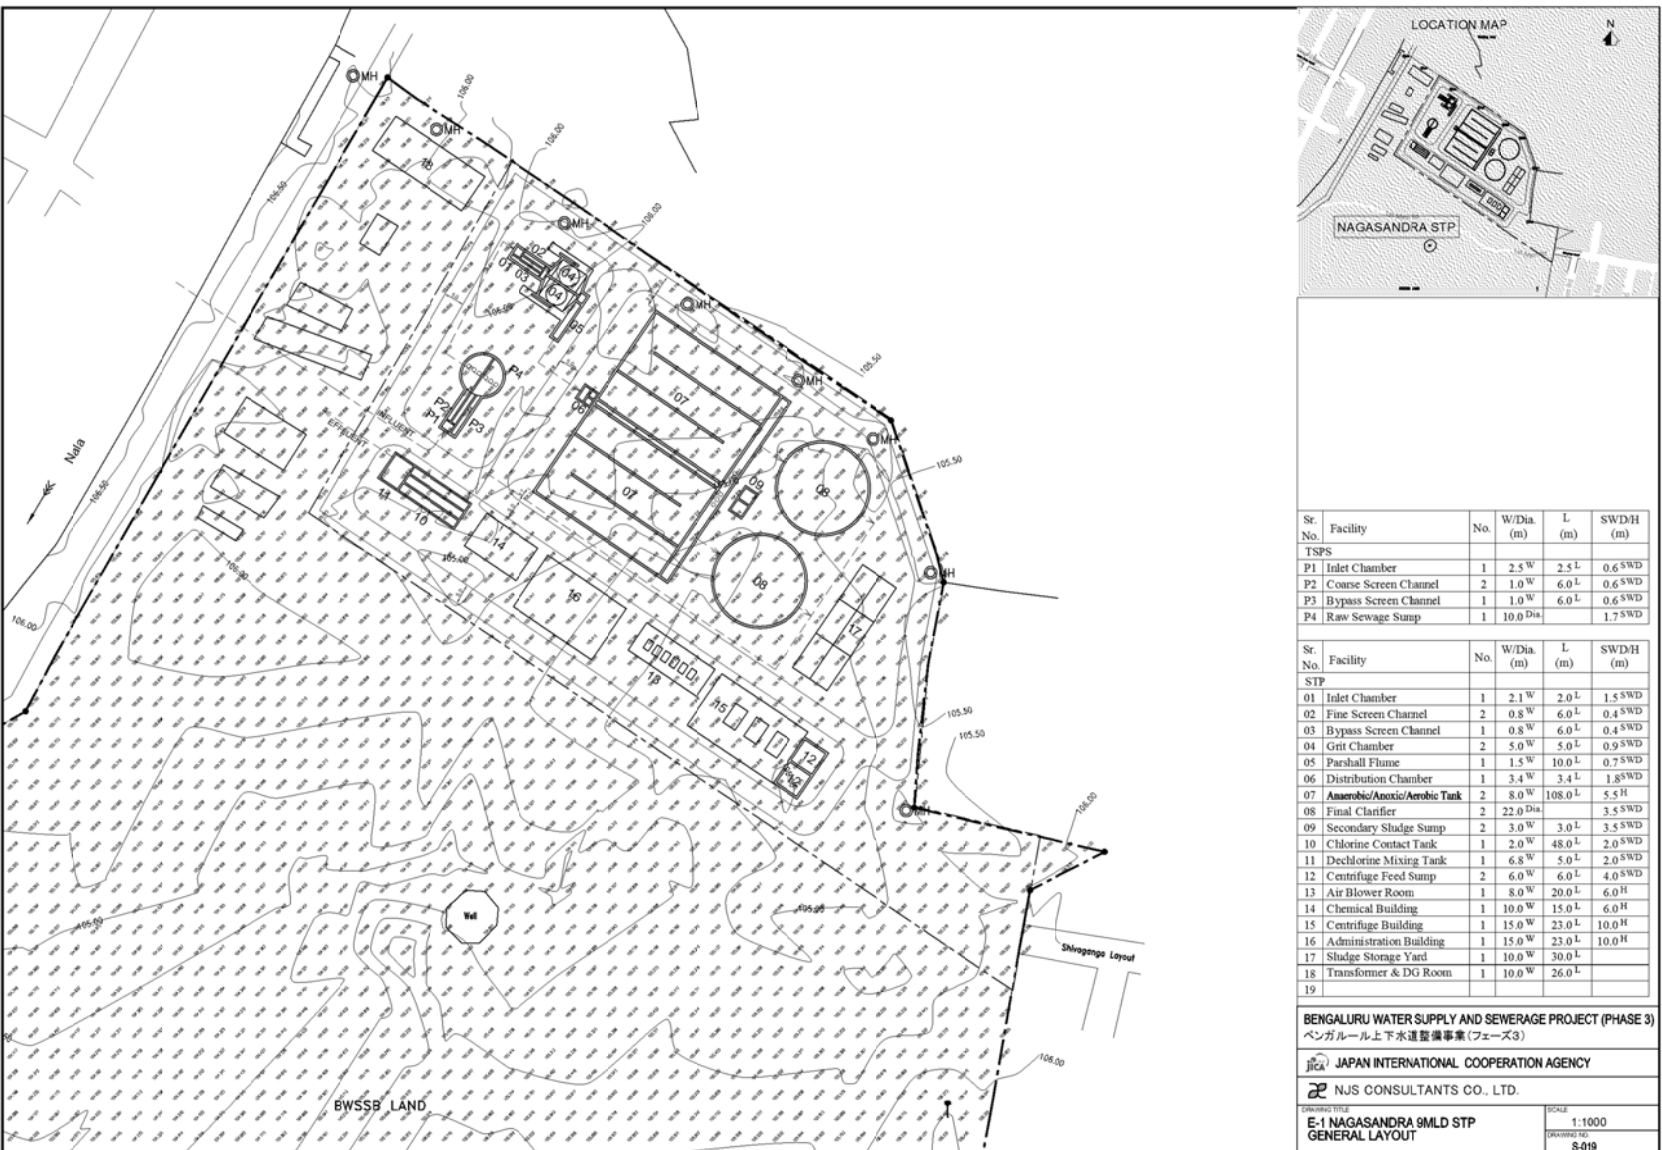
Layout Plan of Nagasandra (Stage V) STP
